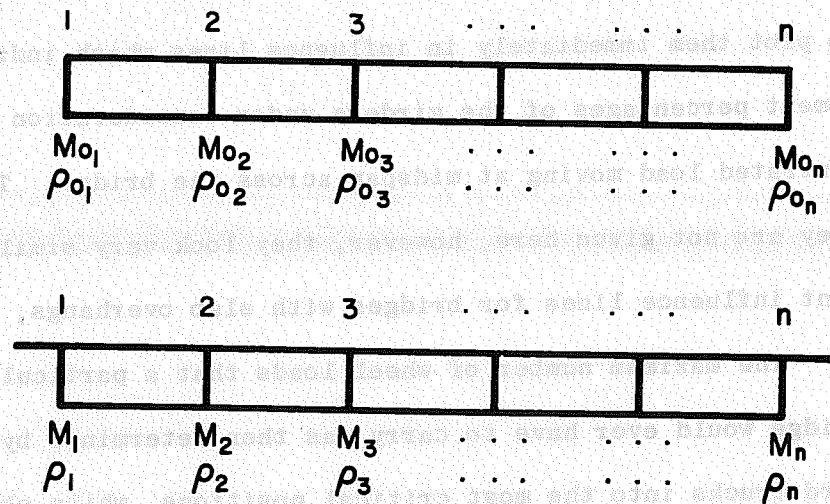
GIRDER MOMENTS AND ρ -FACTORS OF GENERAL BOX GIRDER BRIDGE WITHOUT AND WITH SLAB OVERHANG
